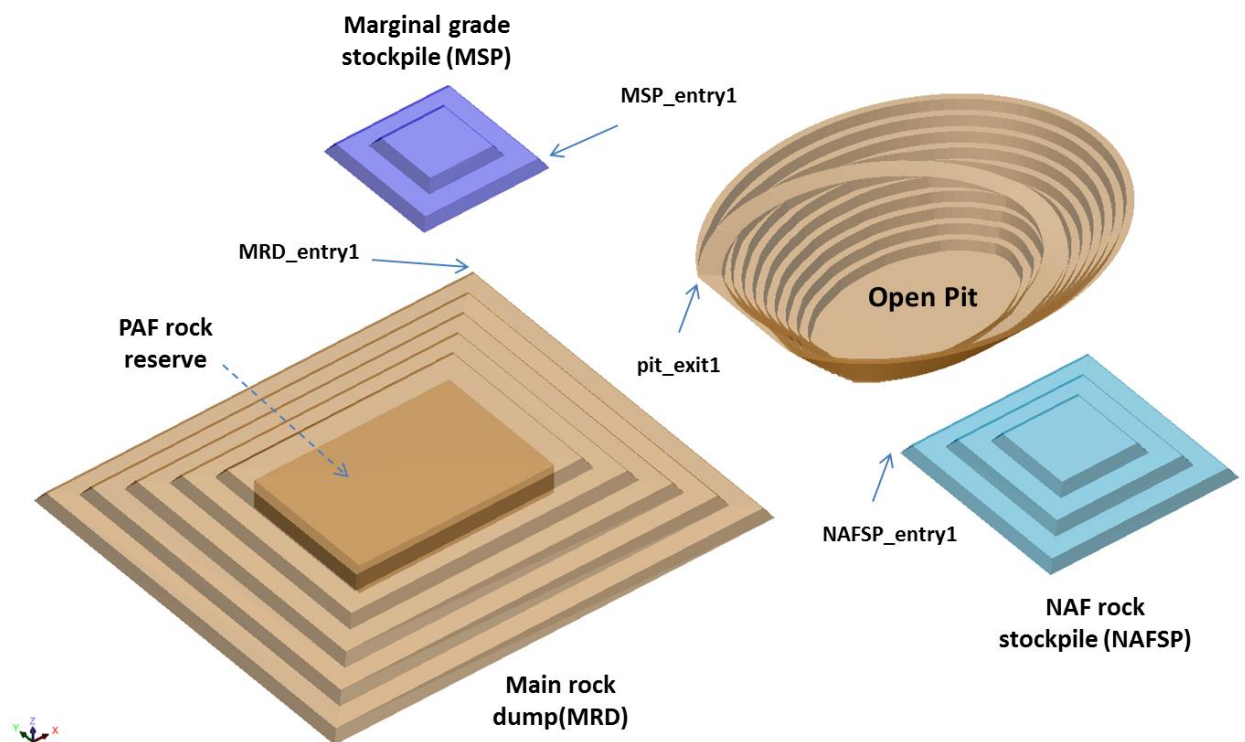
Synthetic mine site layout containing rock dumps and the pit
